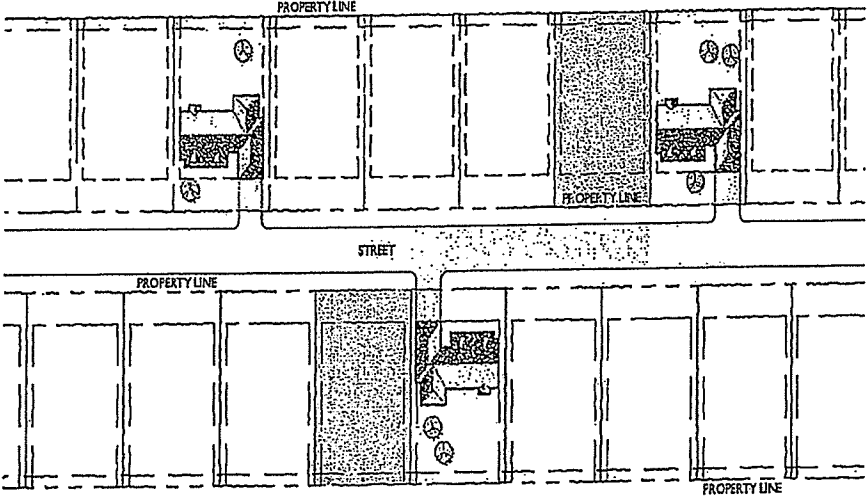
Same Plan, Different Elevation, Opposite Side of Street: one full lot must separate homes that share a floor plan, have different elevations, but occur on opposite sides of the street.
